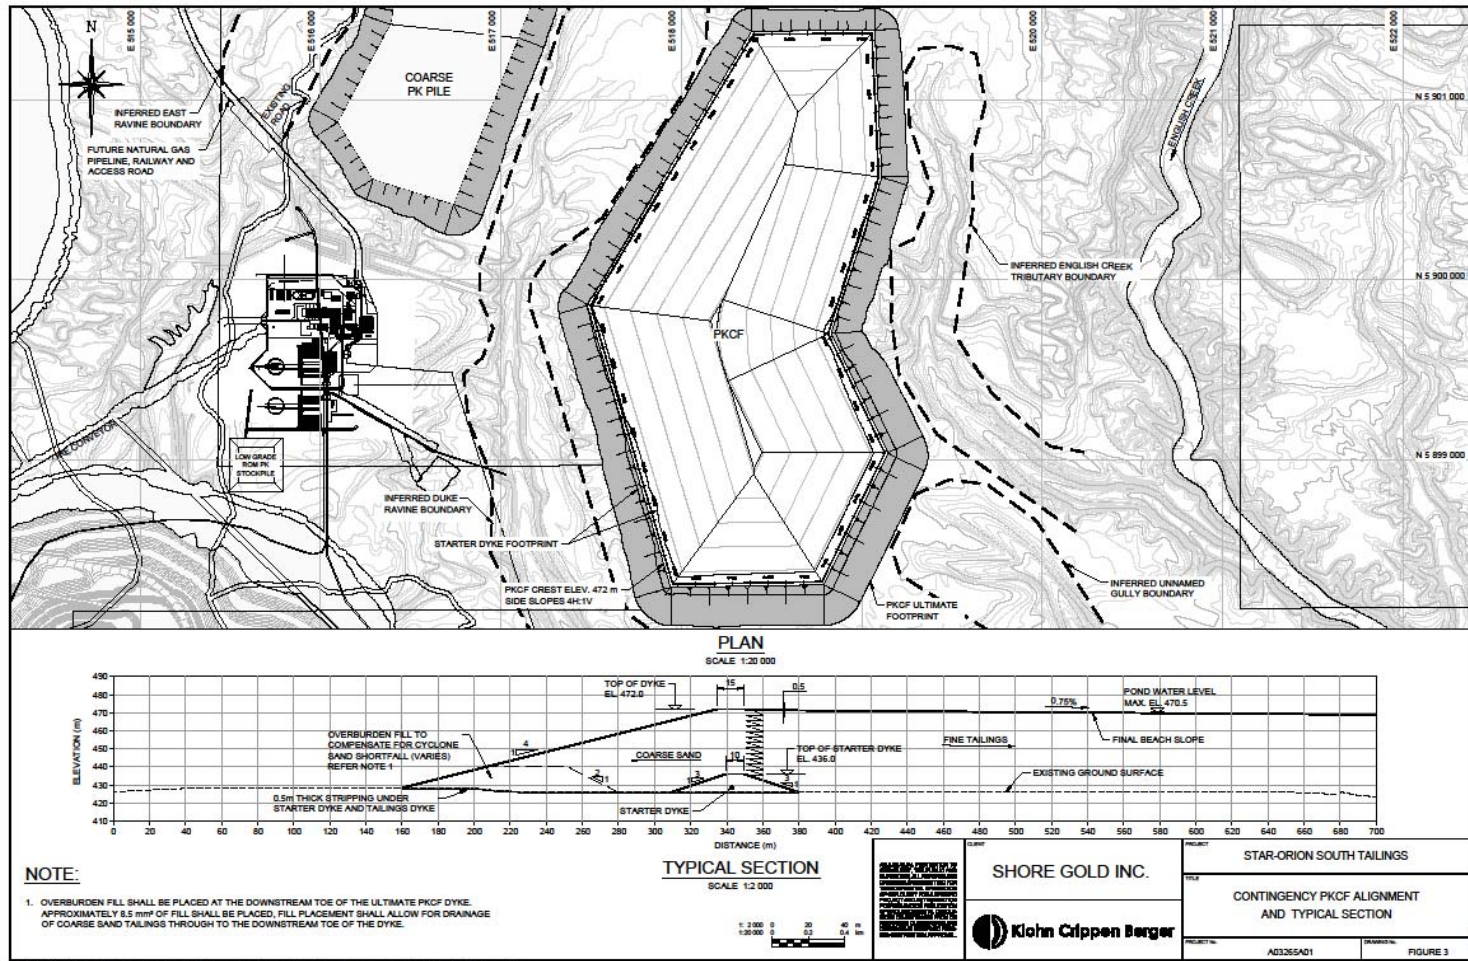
Contingency PKCF Alignment and Typical Section
